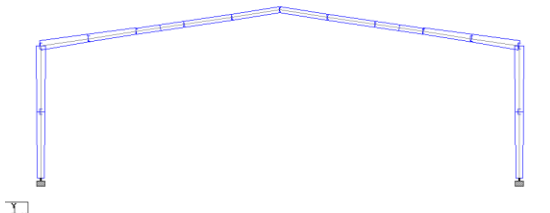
Staad-Pro Generated Elevation of Web tapered steel portal frames
